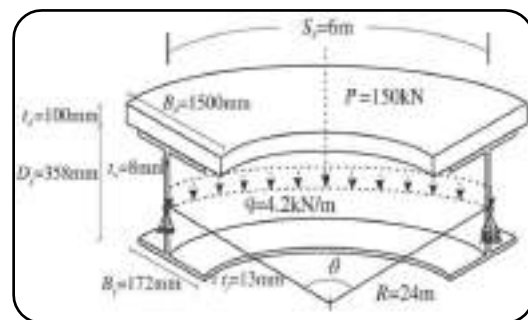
Geometric and boundary condition with Beam modeling ^[63].
